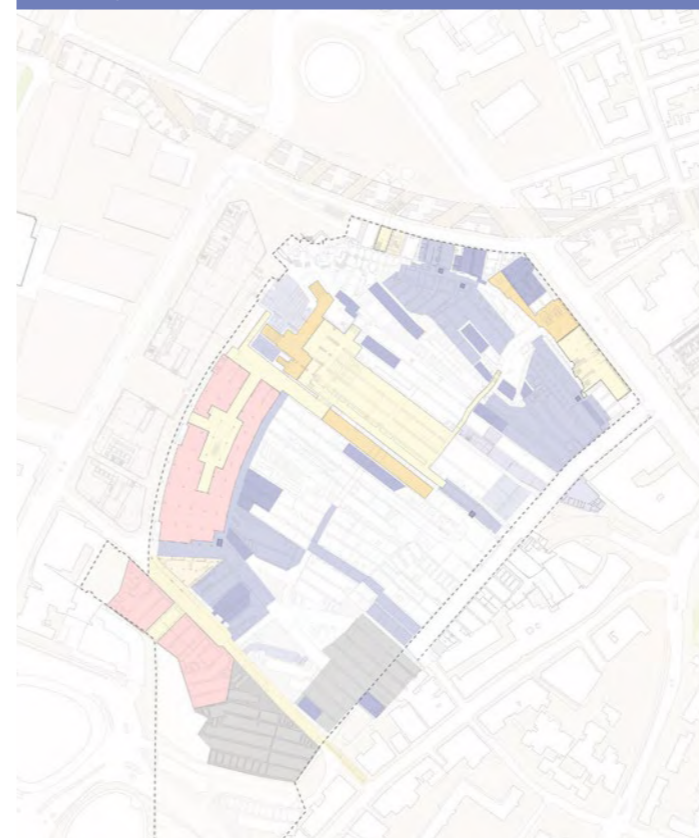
Grade / Undercrofts Level Sketch Plan
